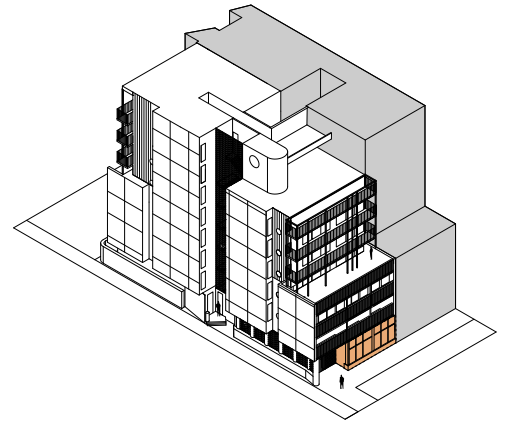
Active ground plane introduced through the inclusion of a retail store facing Duckett Street (shown in orange).
